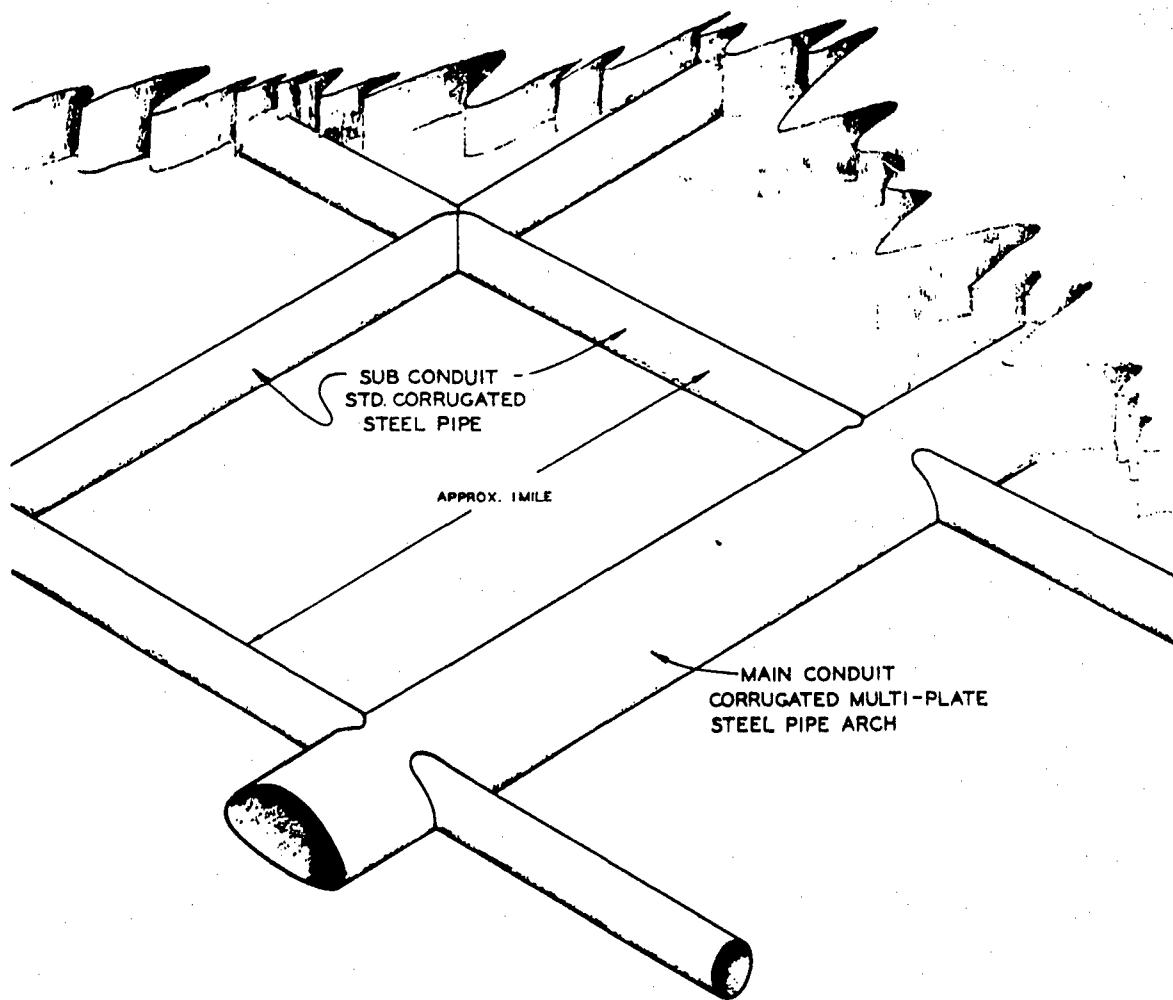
Plan View of Buried Conduit System for Tucson, Arizona
